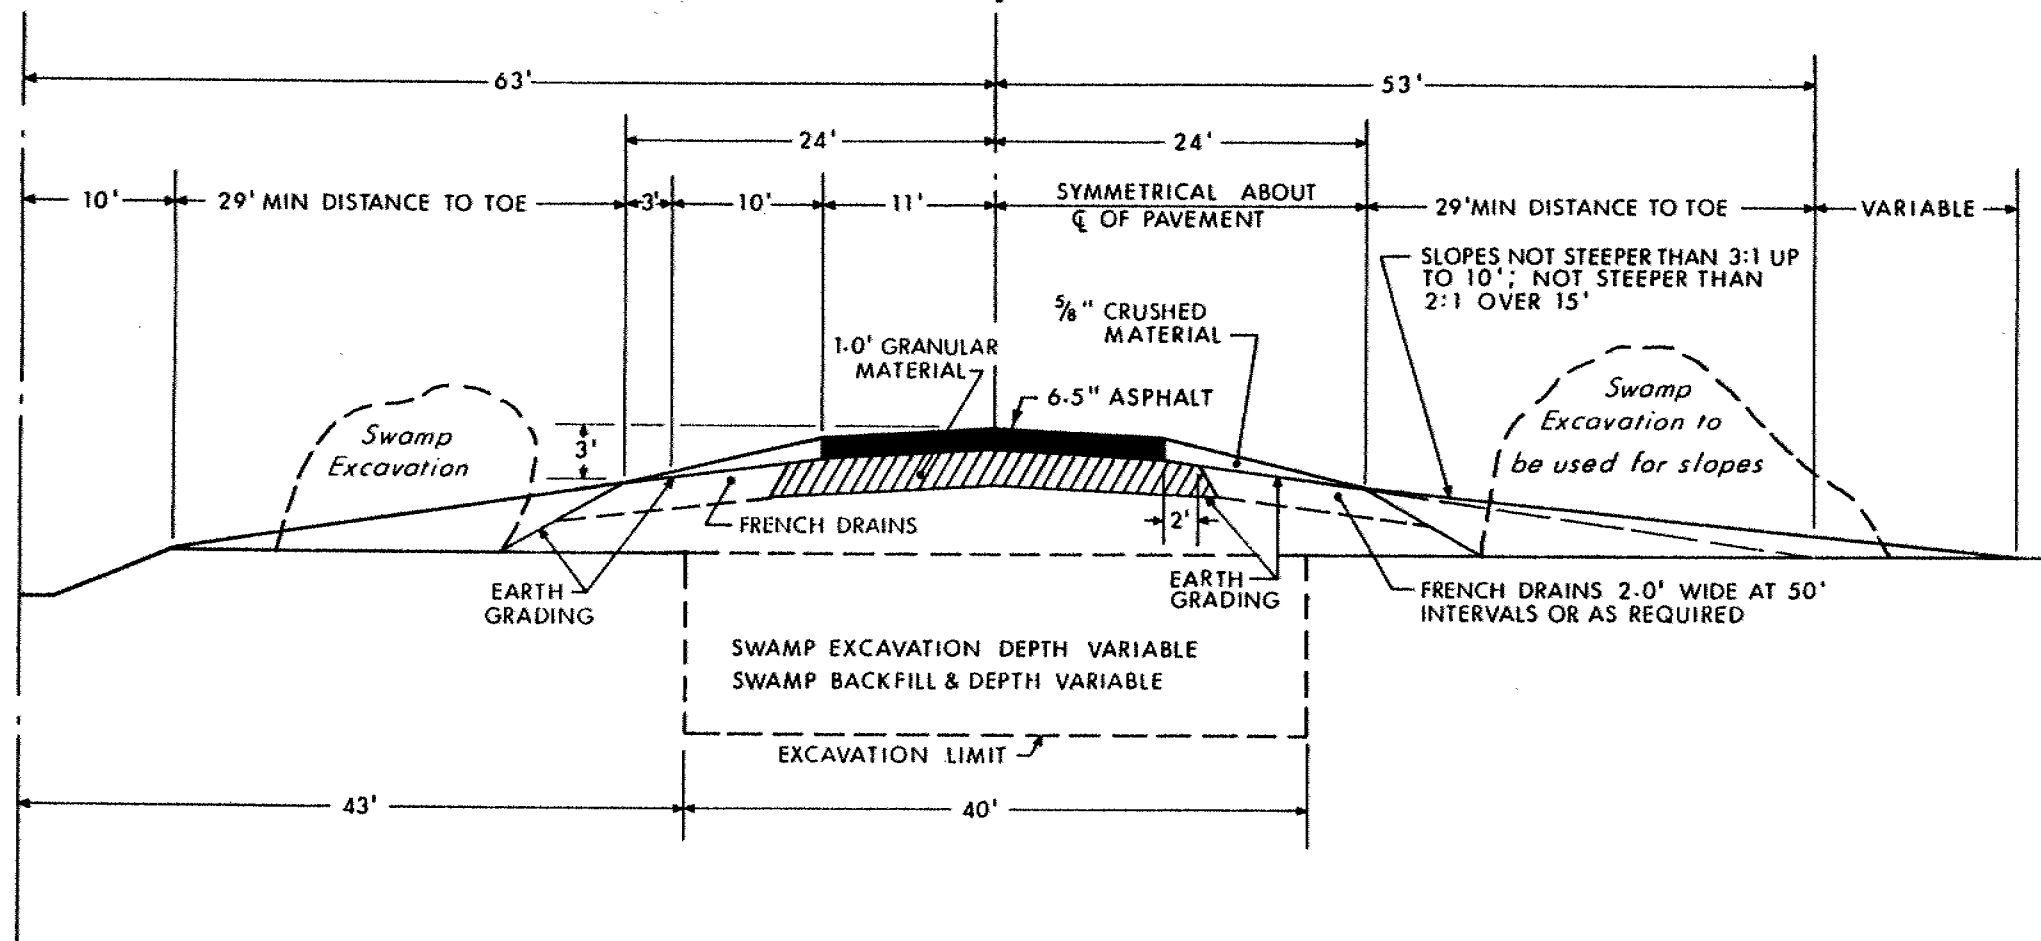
Cross-Section Showing Limits of Peat Excavation and Pavement Structure under Contract 46-14
